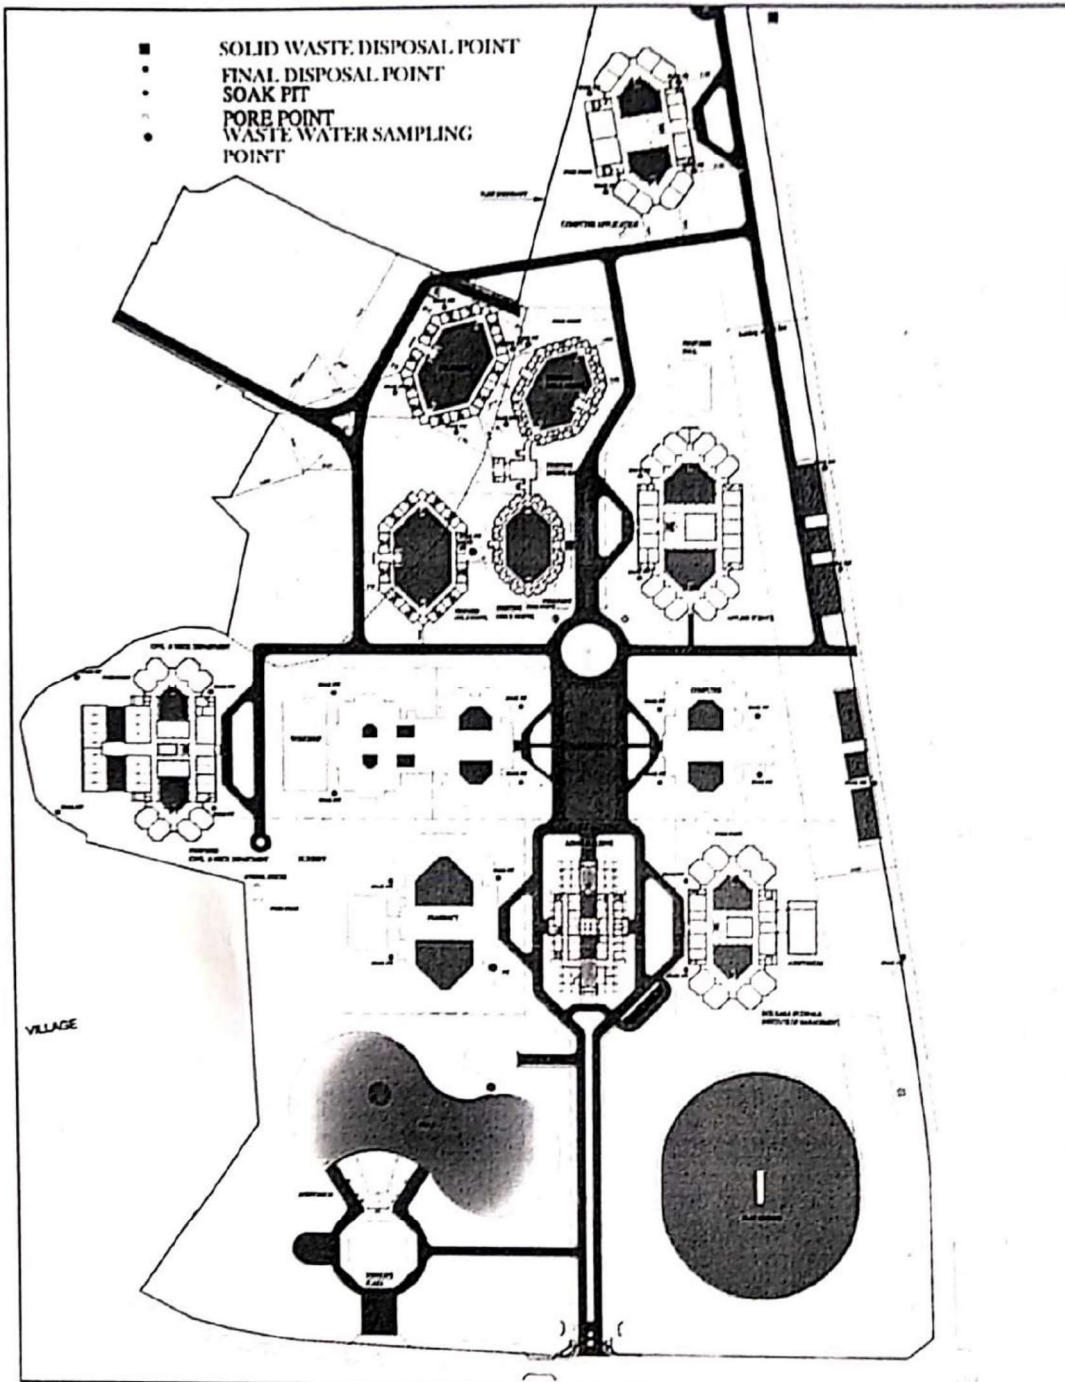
Site Plan of CHARUSAT mentioning location of Soak Pits/ Sampling points, etc.
